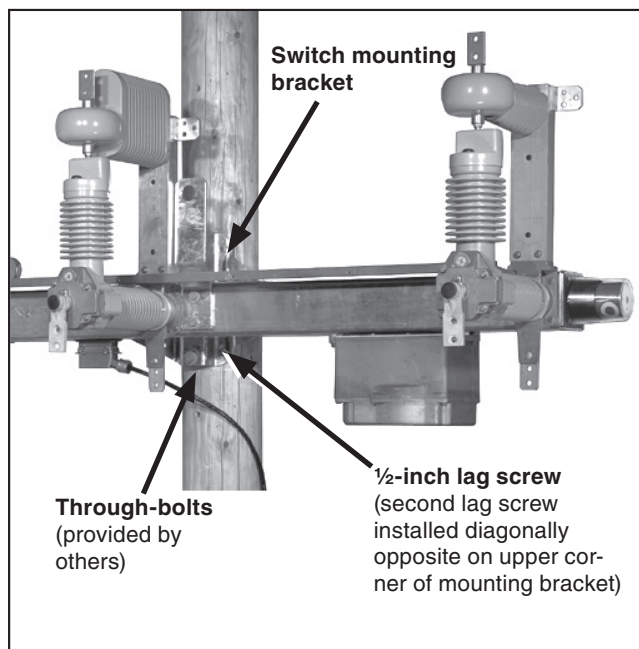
Guiding switch into through-bolts (vertical mounting configuration shown).
